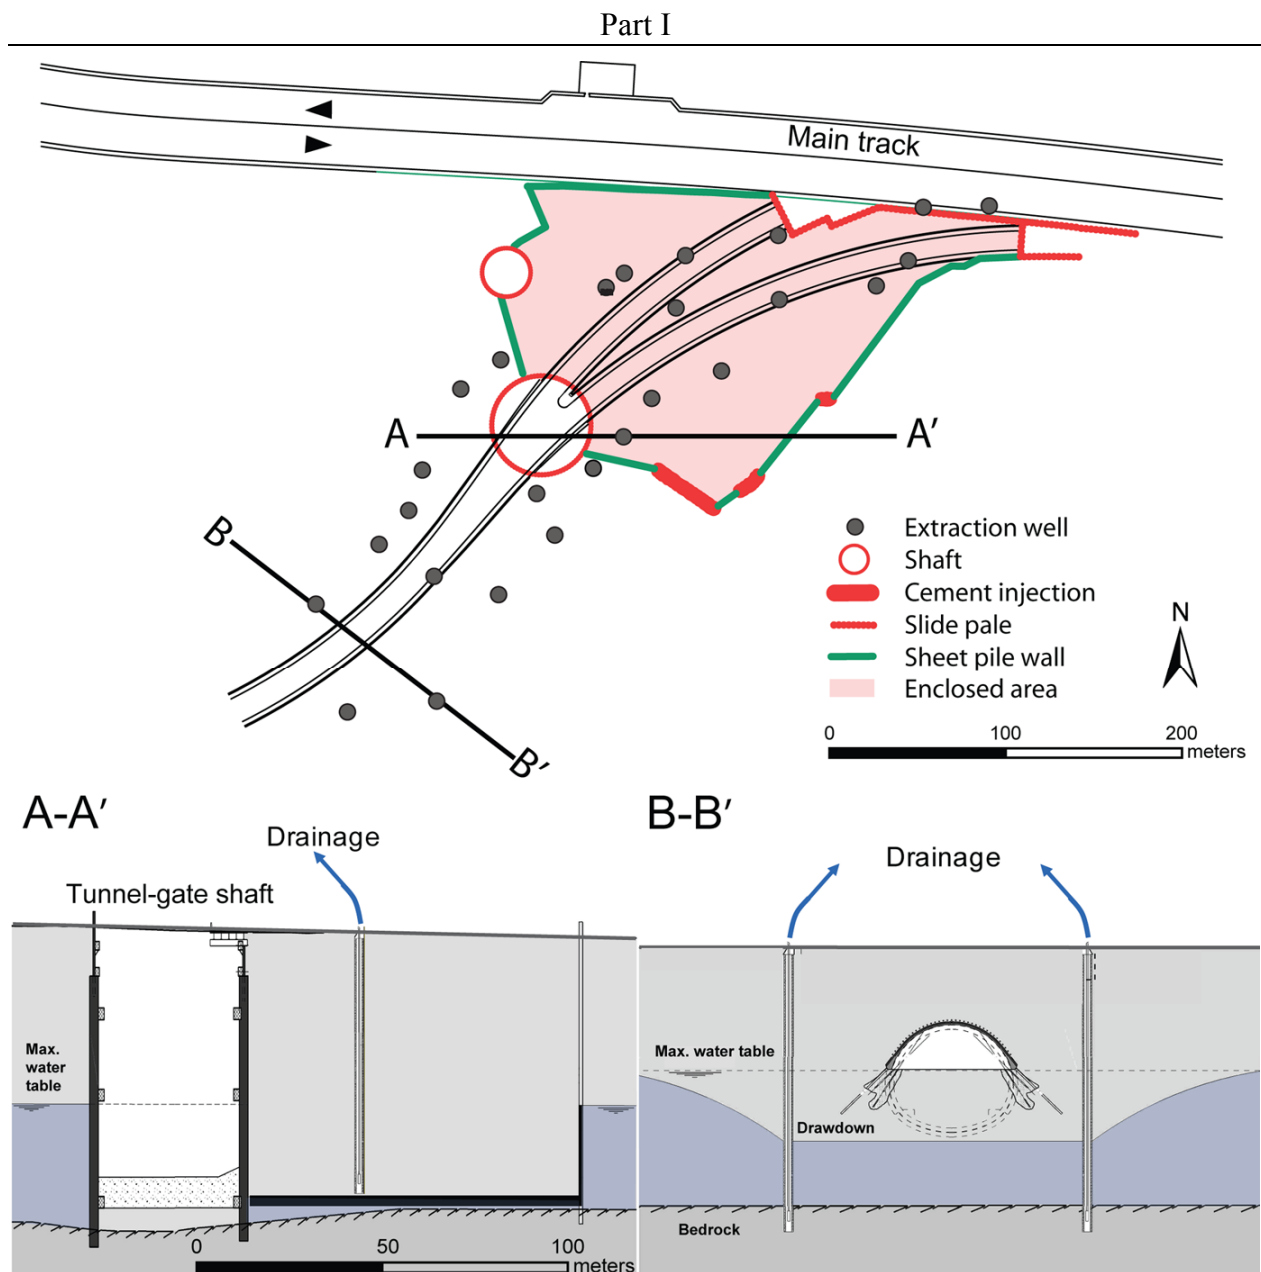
Illustration of different drainage systems employed. Cross section A–A': dewatering of residual groundwater in areas enclosed; cross section B–B': open sump drainage
